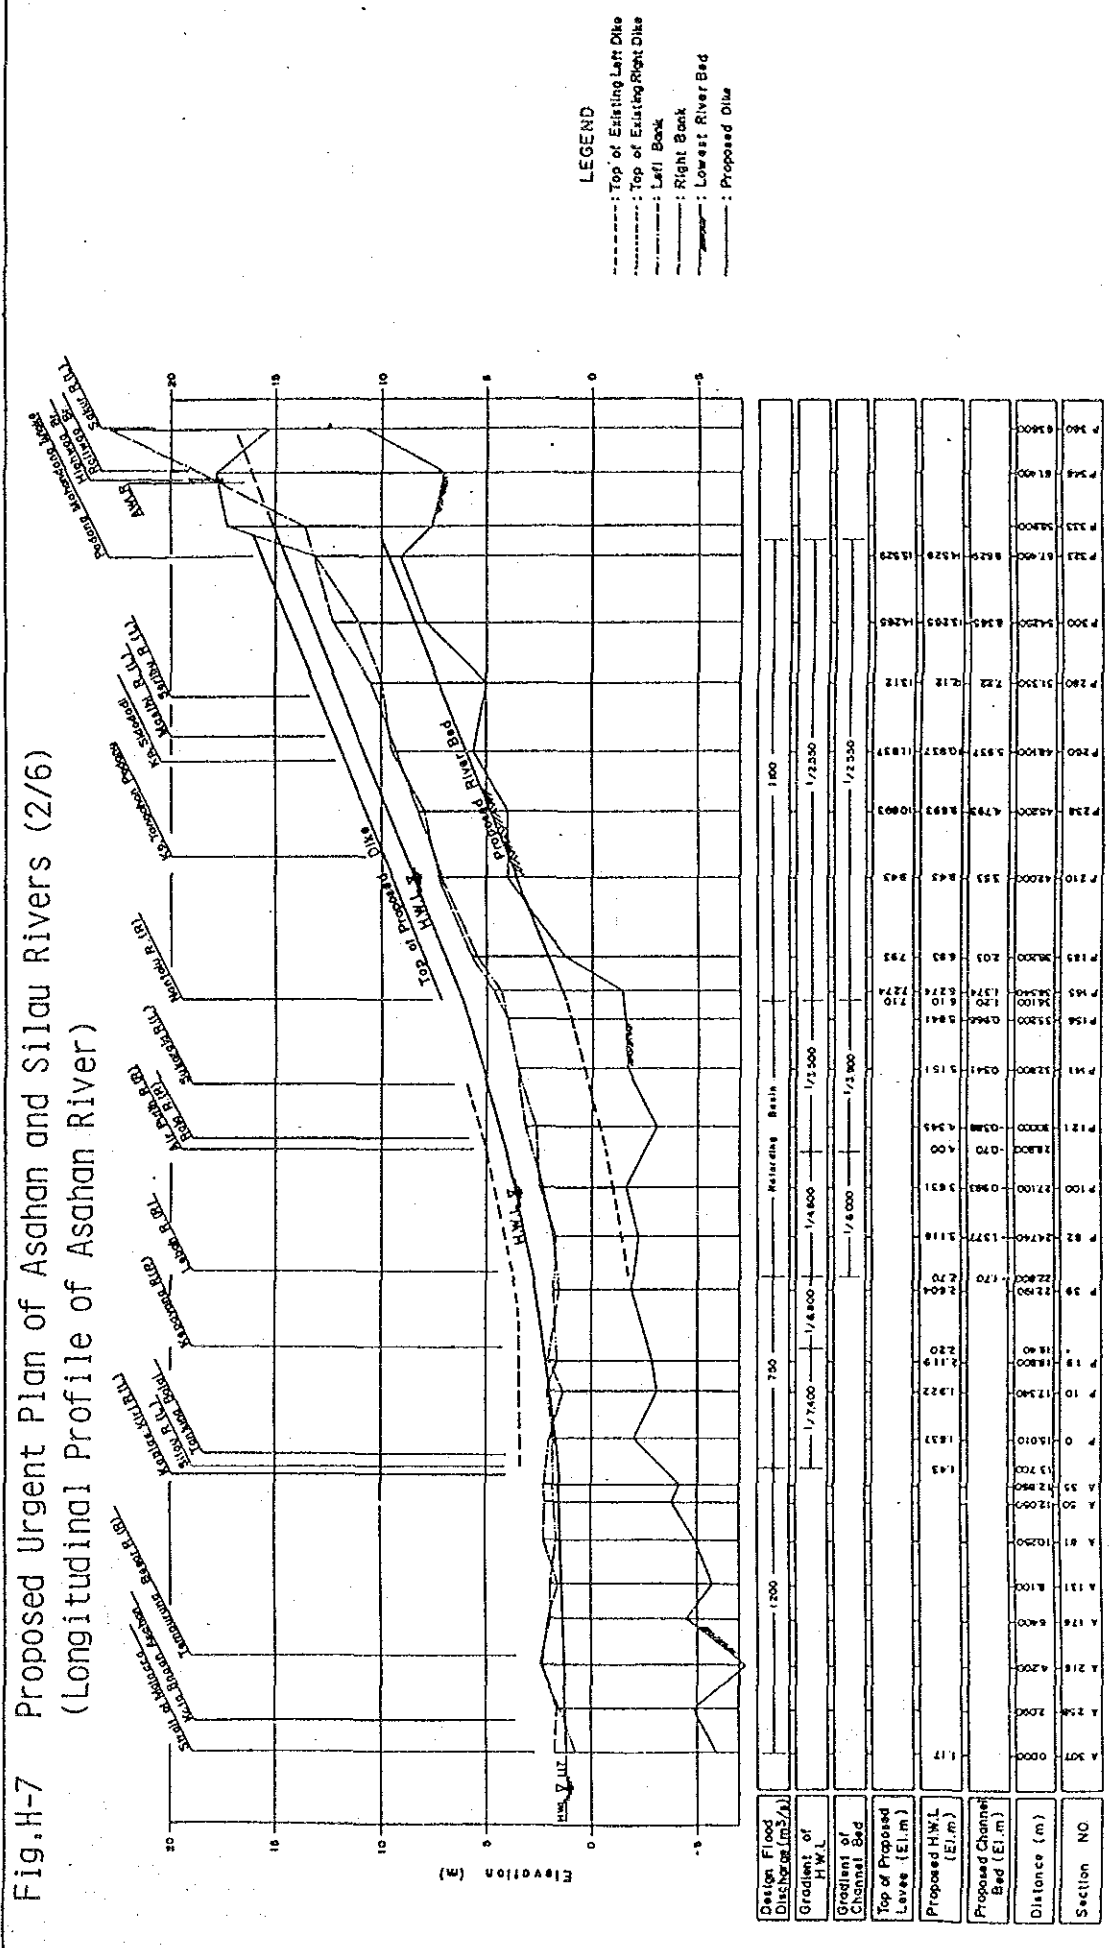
Proposed Urgent Plan of Asahan and Silau Rivers (2/6)
